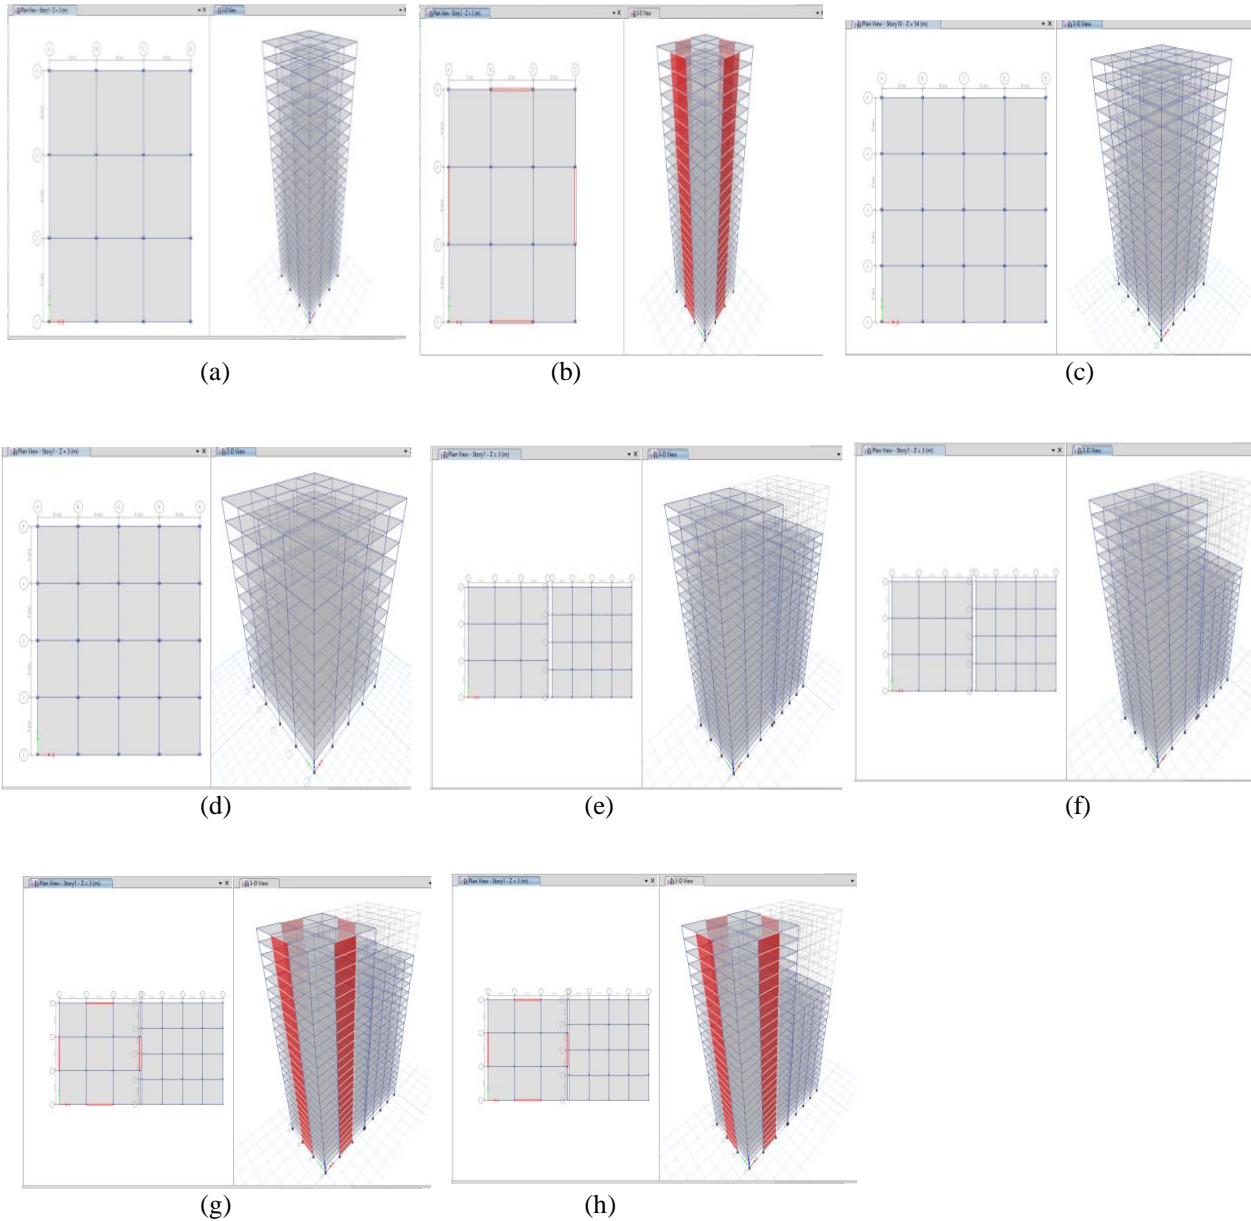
(a) Plan and 3D view of (G+22) building without shear wall., (b) Plan and 3D view of (G+22) building with shear wall. (c) Plan and 3D view of (G+18) building.,(d) Plan and 3D view of (G+10) building., (e) Plan and 3D view of (G+22 and G+18) buildings without shear wall., (f) Plan and 3D view of (G+22 and G+14) buildings without shear wall., (g) Plan and 3d view of (G+22 and G+18) buildings with shear wall., (h) Plan and 3D view of (G+22 and G+14) buildings with shear wall.
